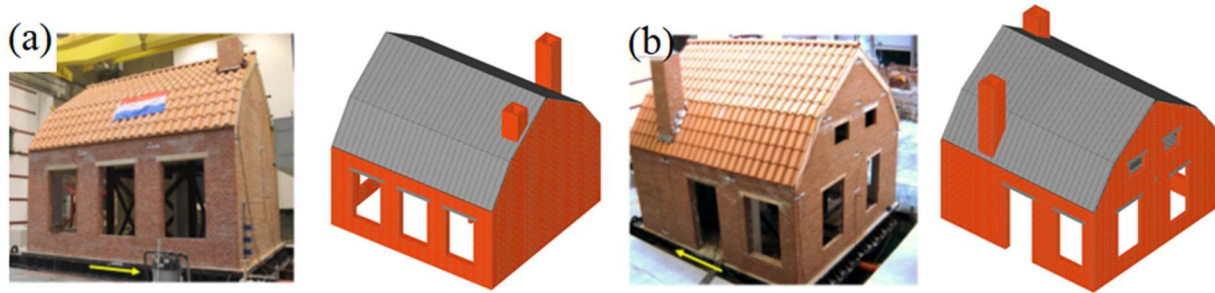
## DETAILED MICRO-MODELING OF A FULL-SCALE URM BUILDING SPECIMEN
